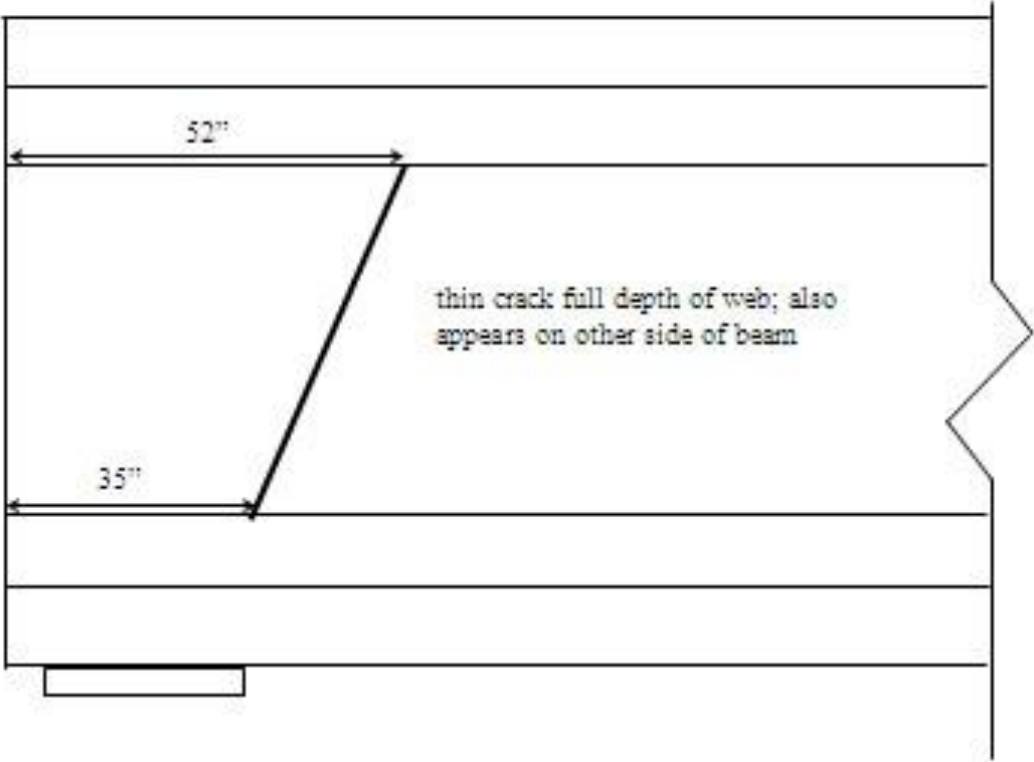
Crack diagram for girder on south span, north end, 6th beam from east side, west face (#7933).
